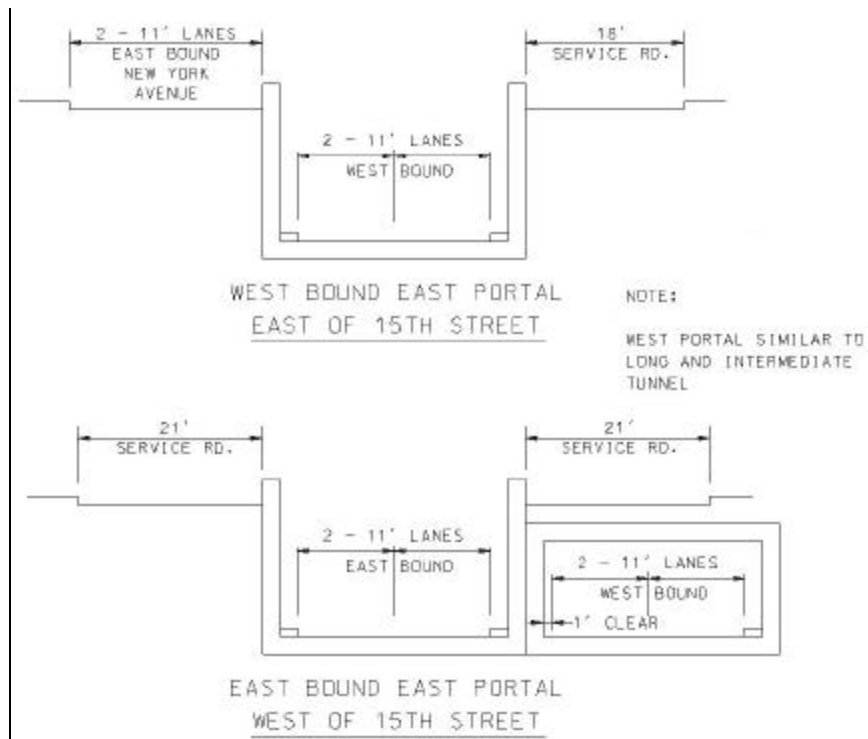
Preliminary Split-Portal Tunnel Cross-Sections
